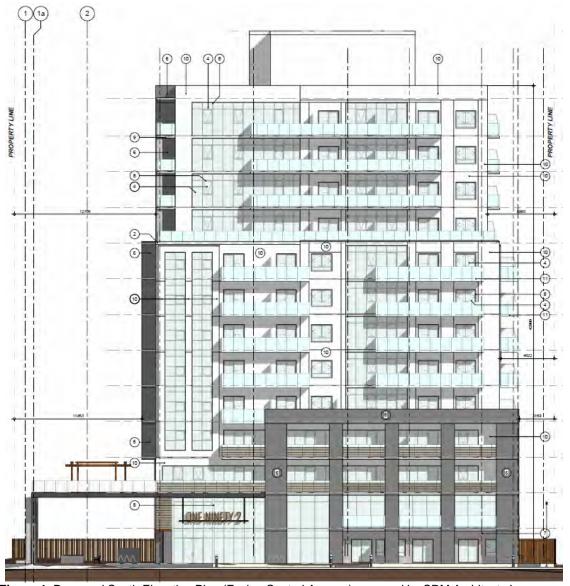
Proposed South Elevation Plan (Facing Central Avenue) prepared by SRM Architects Inc.
